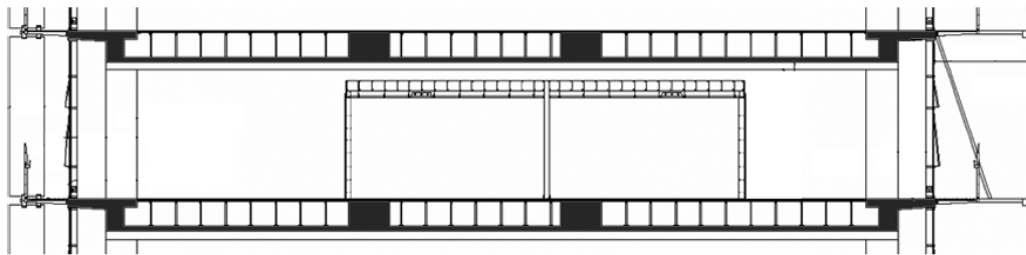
Generic section through the tower section showing interior cabin workspaces [17].
